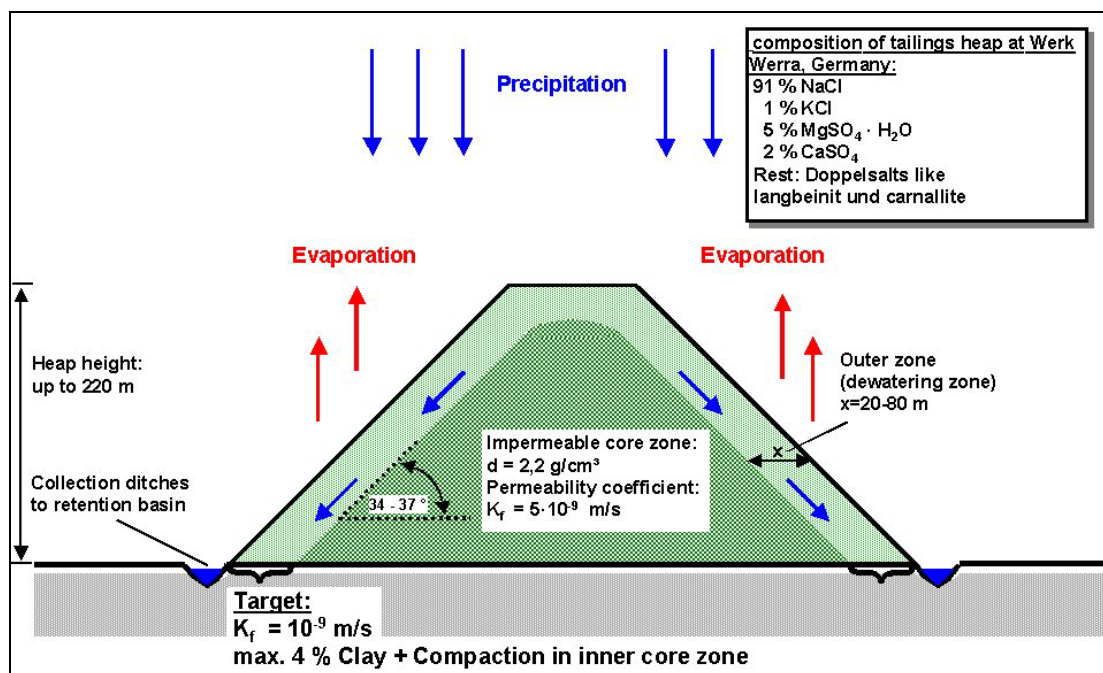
Schematic drawing of a tailings heap in German potash mining
